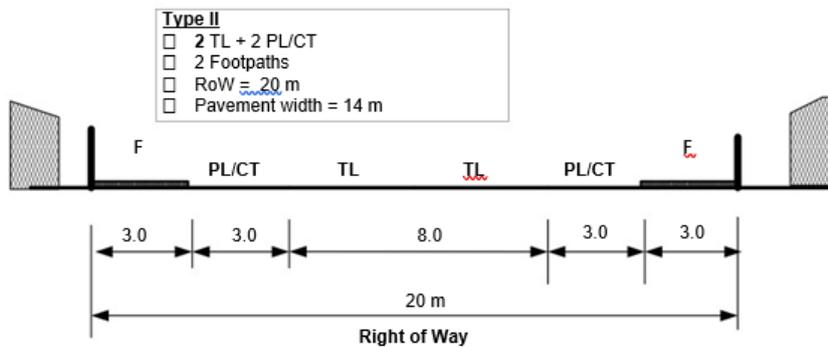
, Typical Cross-section for DCRN Roads (with RoW 20 m)
